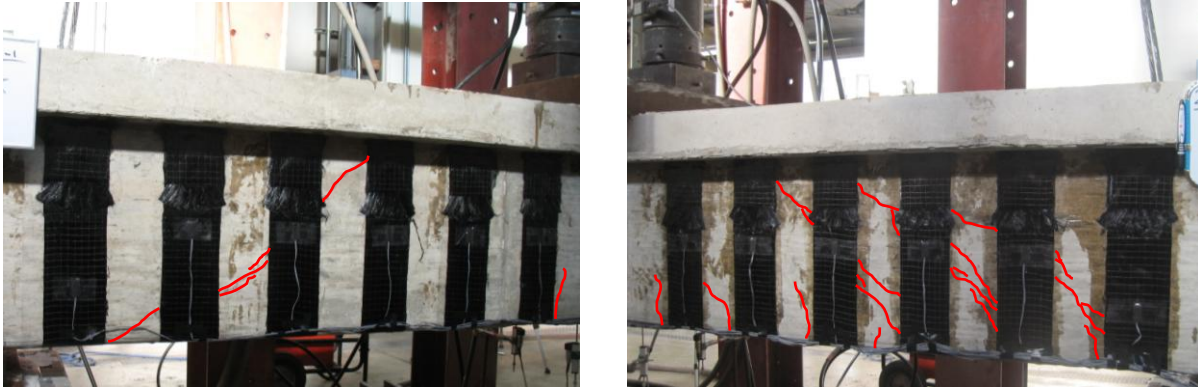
24-3-Fatigue-1&2 unbonded (left) and bonded (right) CFRP test specimen
